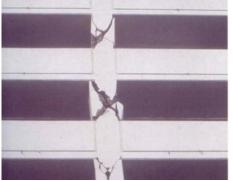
Failure of strong beam-weak column due to the integrity of parapets with beams; the 1994 Northridge earthquake, California (Bachmann, 2003)
